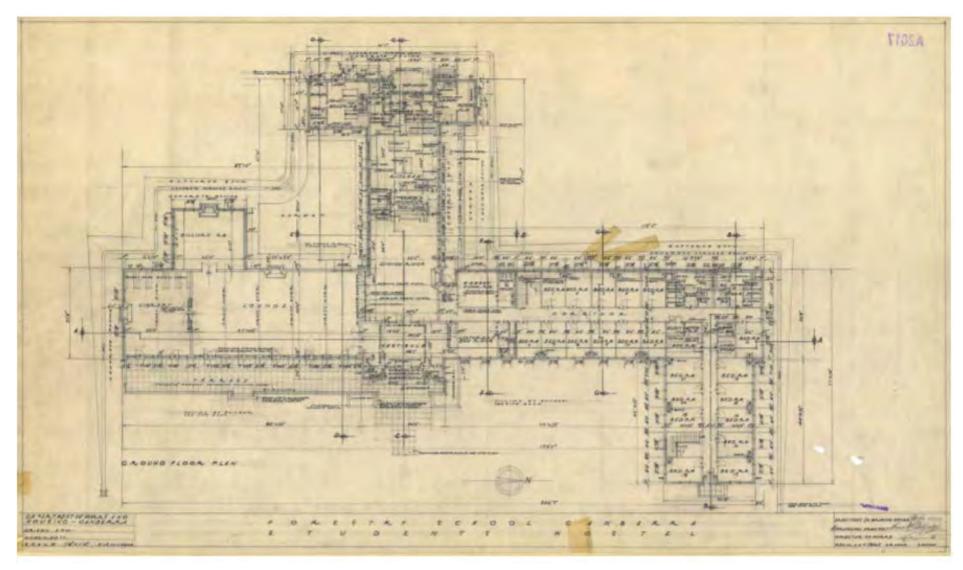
Final ground floor plan for the Forestry School Student Hostel c.1950 (NAA #7689885)
